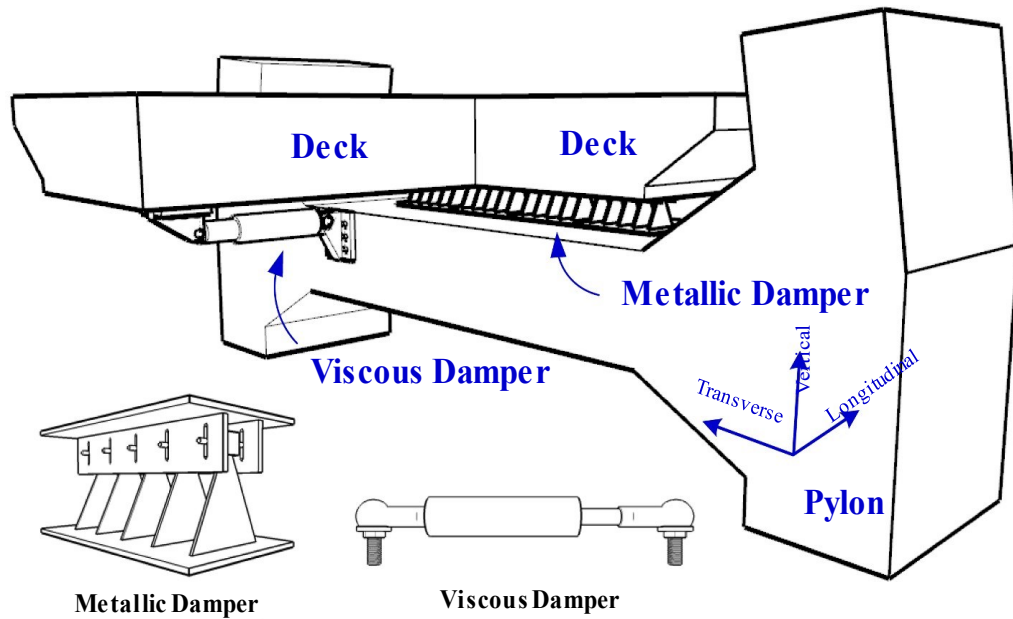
A joint part of a cable-stage bridge design incorporating metallic and viscous passive dampers [46]
